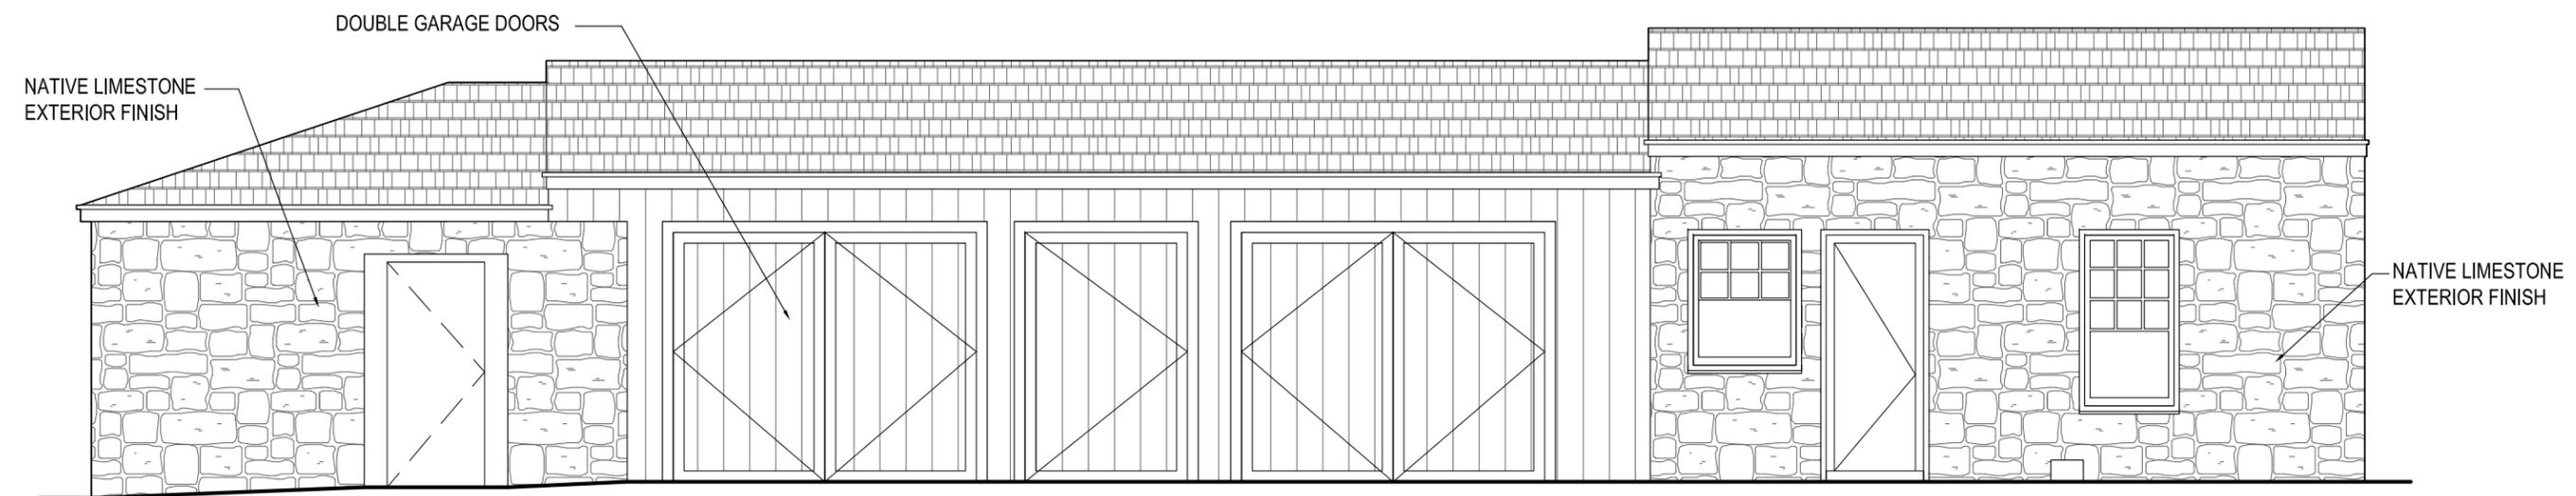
Garage Area and Stone extension, note roof overlap at breakroom and garage connection
